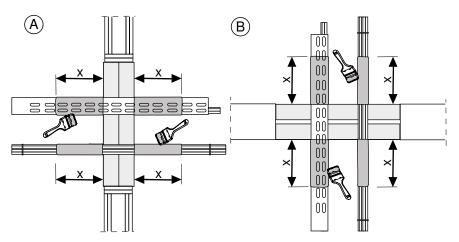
Ablation coating on cables in wall (A) and ceiling (B)
